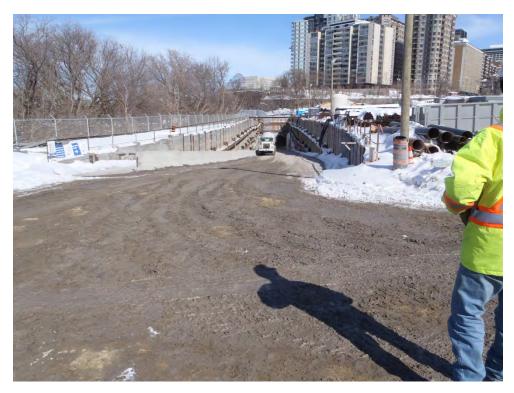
Parking lot located adjacent to the southwest of the OC Transpo Transitway.
